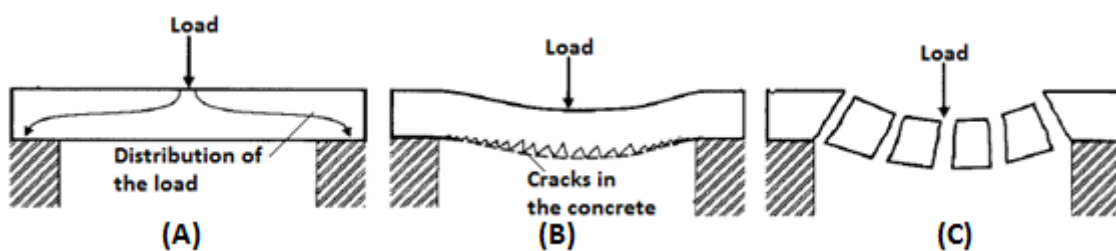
Plain concrete beam. (A)-Beam loaded. (B)-Deflection and cracking of the beam. (C)-Collapse of the beam. (Trevorrow, 1984)
